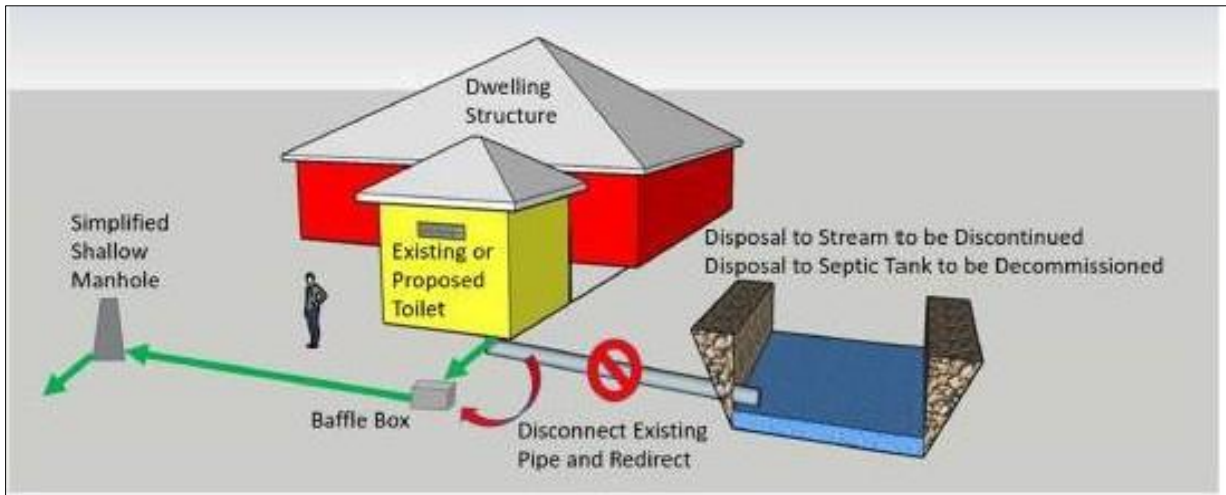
Connection to building with existing or proposed outbuilding toilet.
